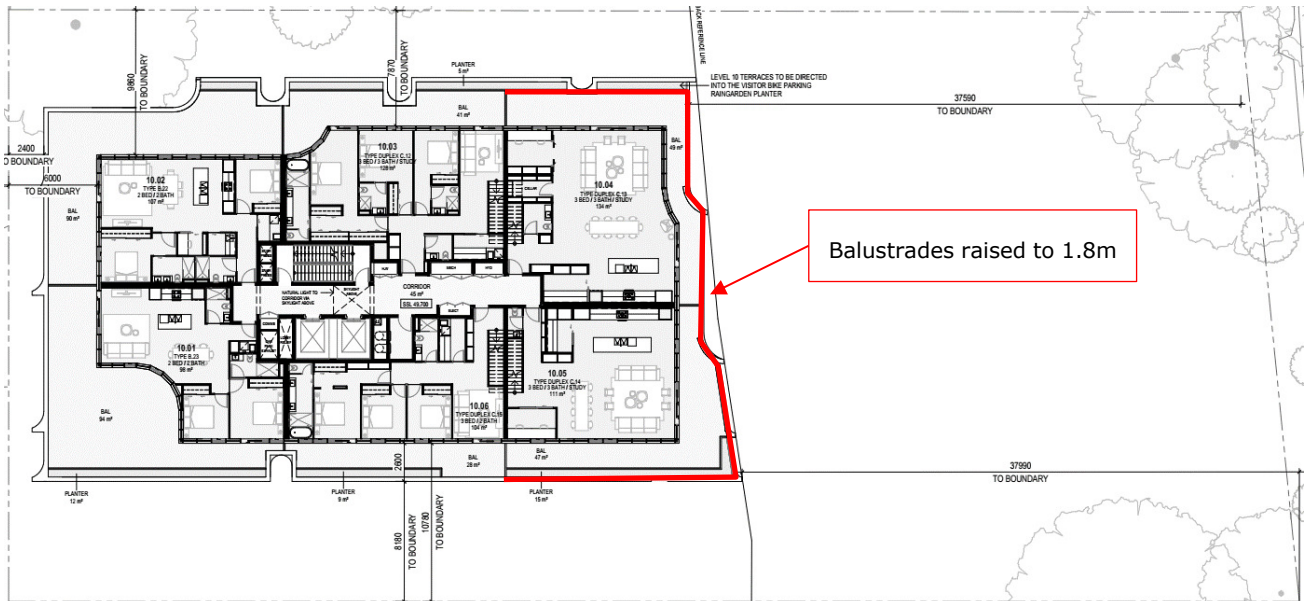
Recommendations for wind amelioration overlaid on the Level 10 floor plan.
